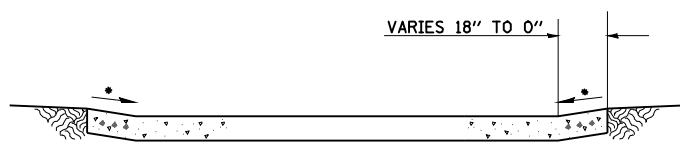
DETAIL C - URBAN PE & CE (NO CURB & GUTTER)
